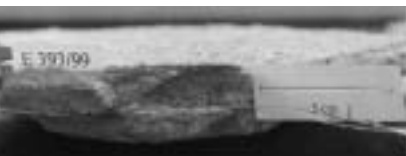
Typical failure showing plaster separated from the facade
